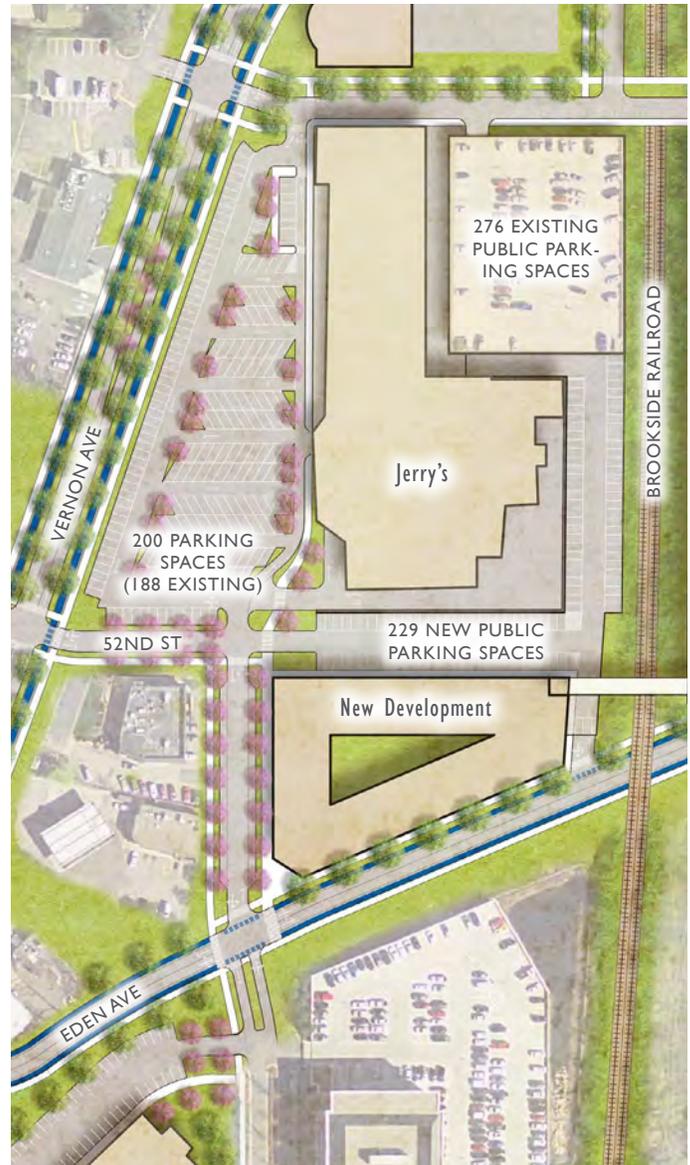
Plan of a new district parking network around and behind Jerry's; 1" = 200'.
